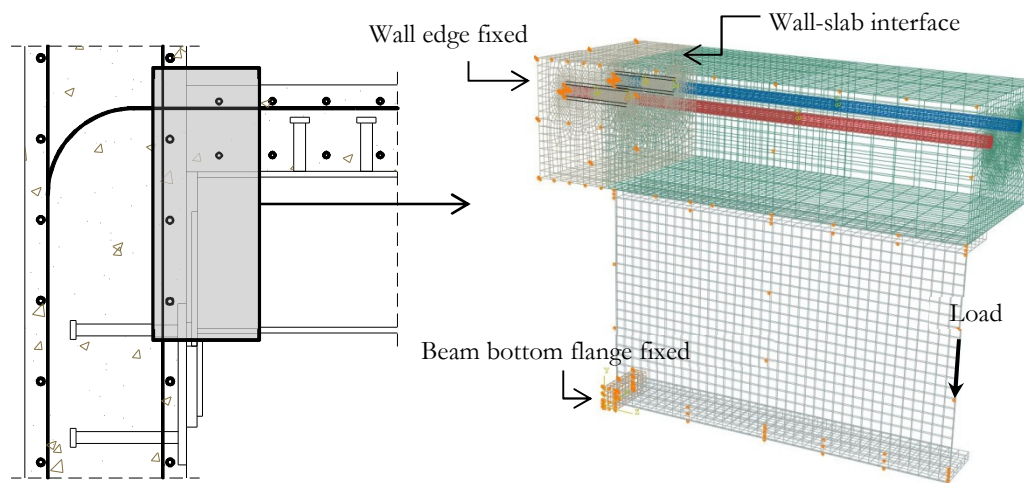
Benchmark example for connection of concrete parts using only longitudinal reinforcement
